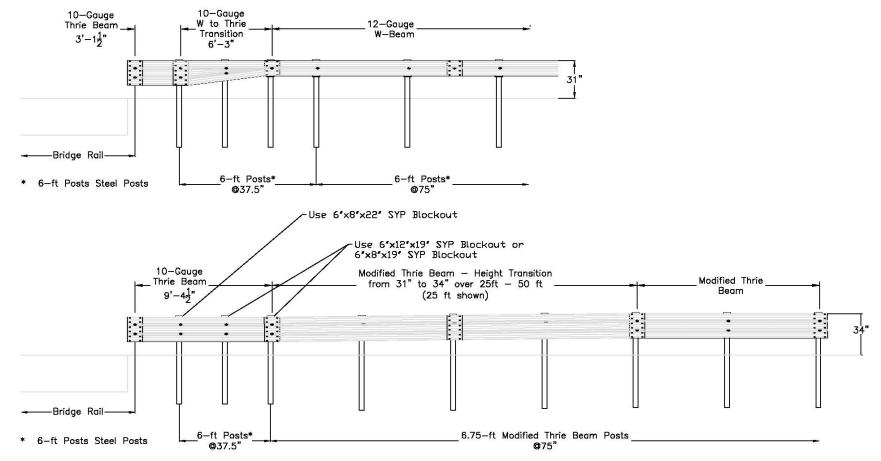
Modified Thrie Beam Transition to MASH TL-2 Thrie-Beam AGT
